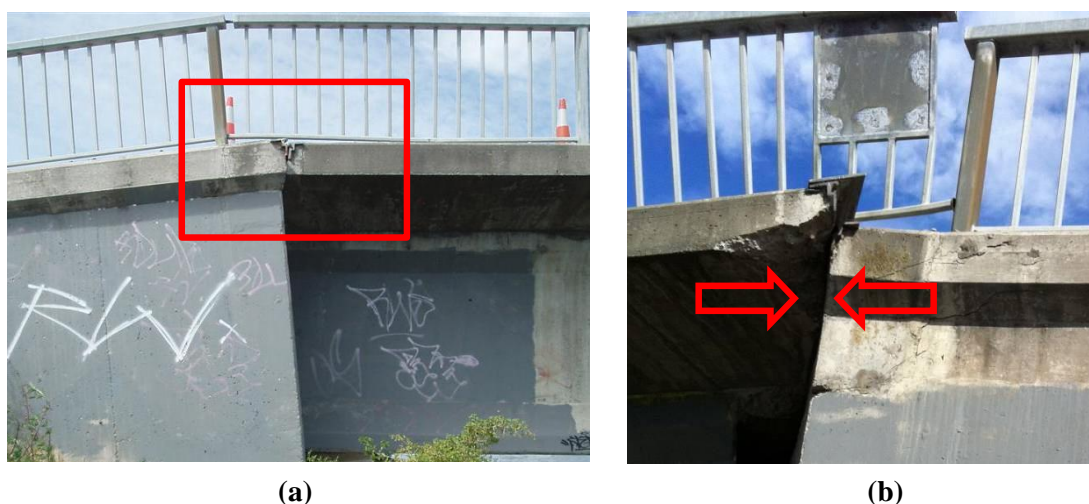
Damage to Bridge St. Bridge deck: (a) abutment gap closure [Courtesy of OPUS] and (b) pounding of the deck on the abutment after Christchurch event [Photo by A. Kivell]
